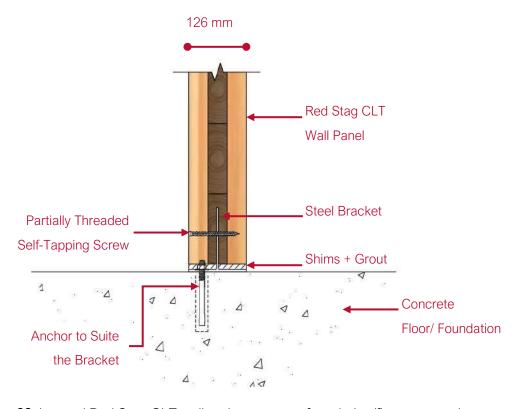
Internal Red Stag CLT wall to the concrete foundation/floor connection.
